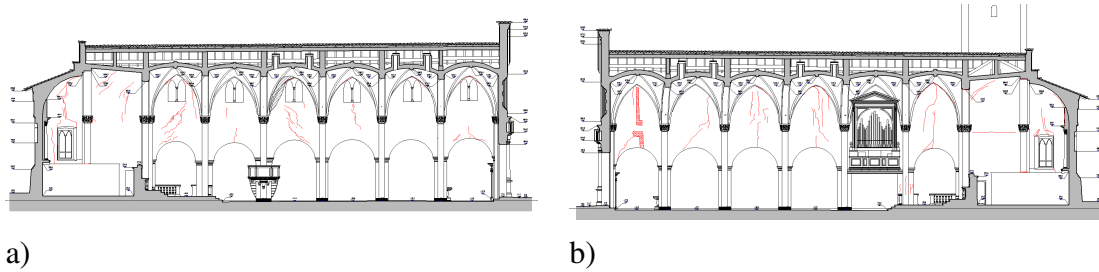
Section view of St. Bassiano showing crack pattern of a) south wall of the main nave and b) north wall of the main nave.
